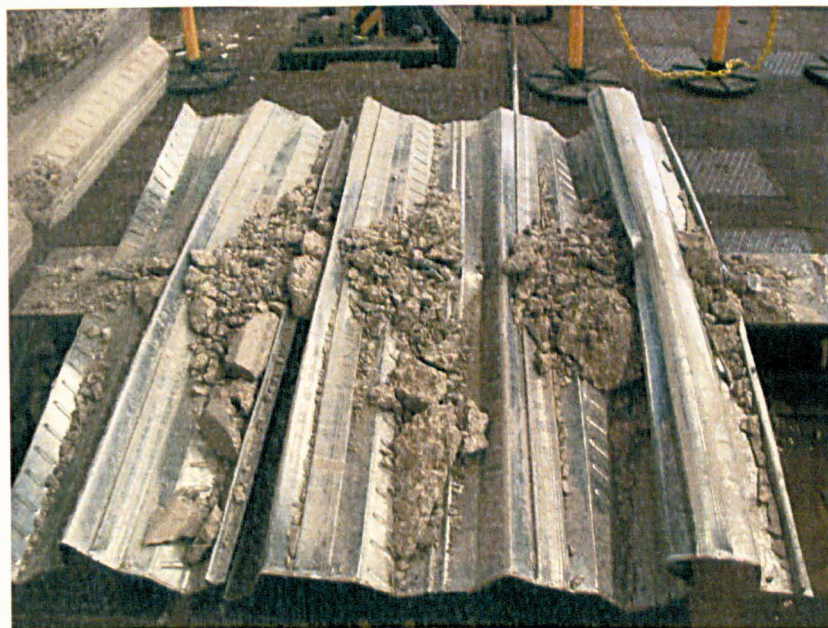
Buckling of steel deck and concrete failure cones in push test PTSN 2-1
